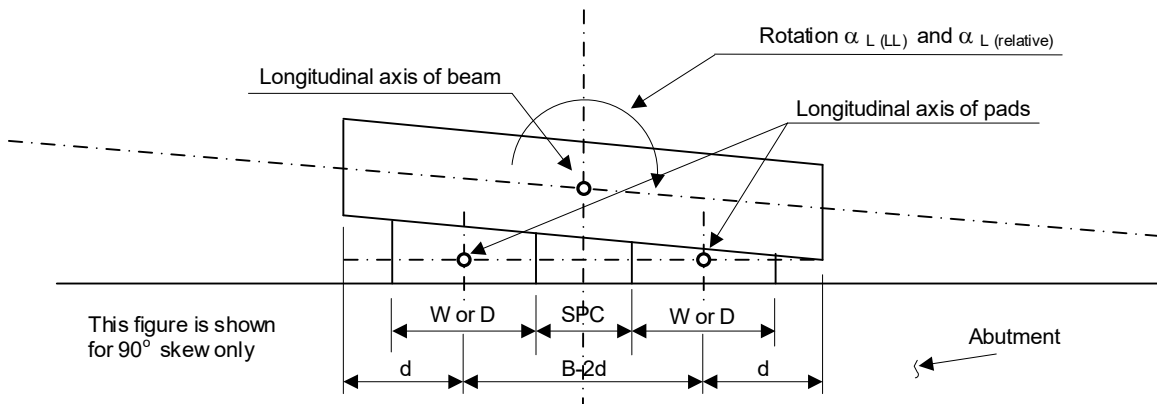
Rotation of Bearing Pad (Section Through Beam and Pads)
